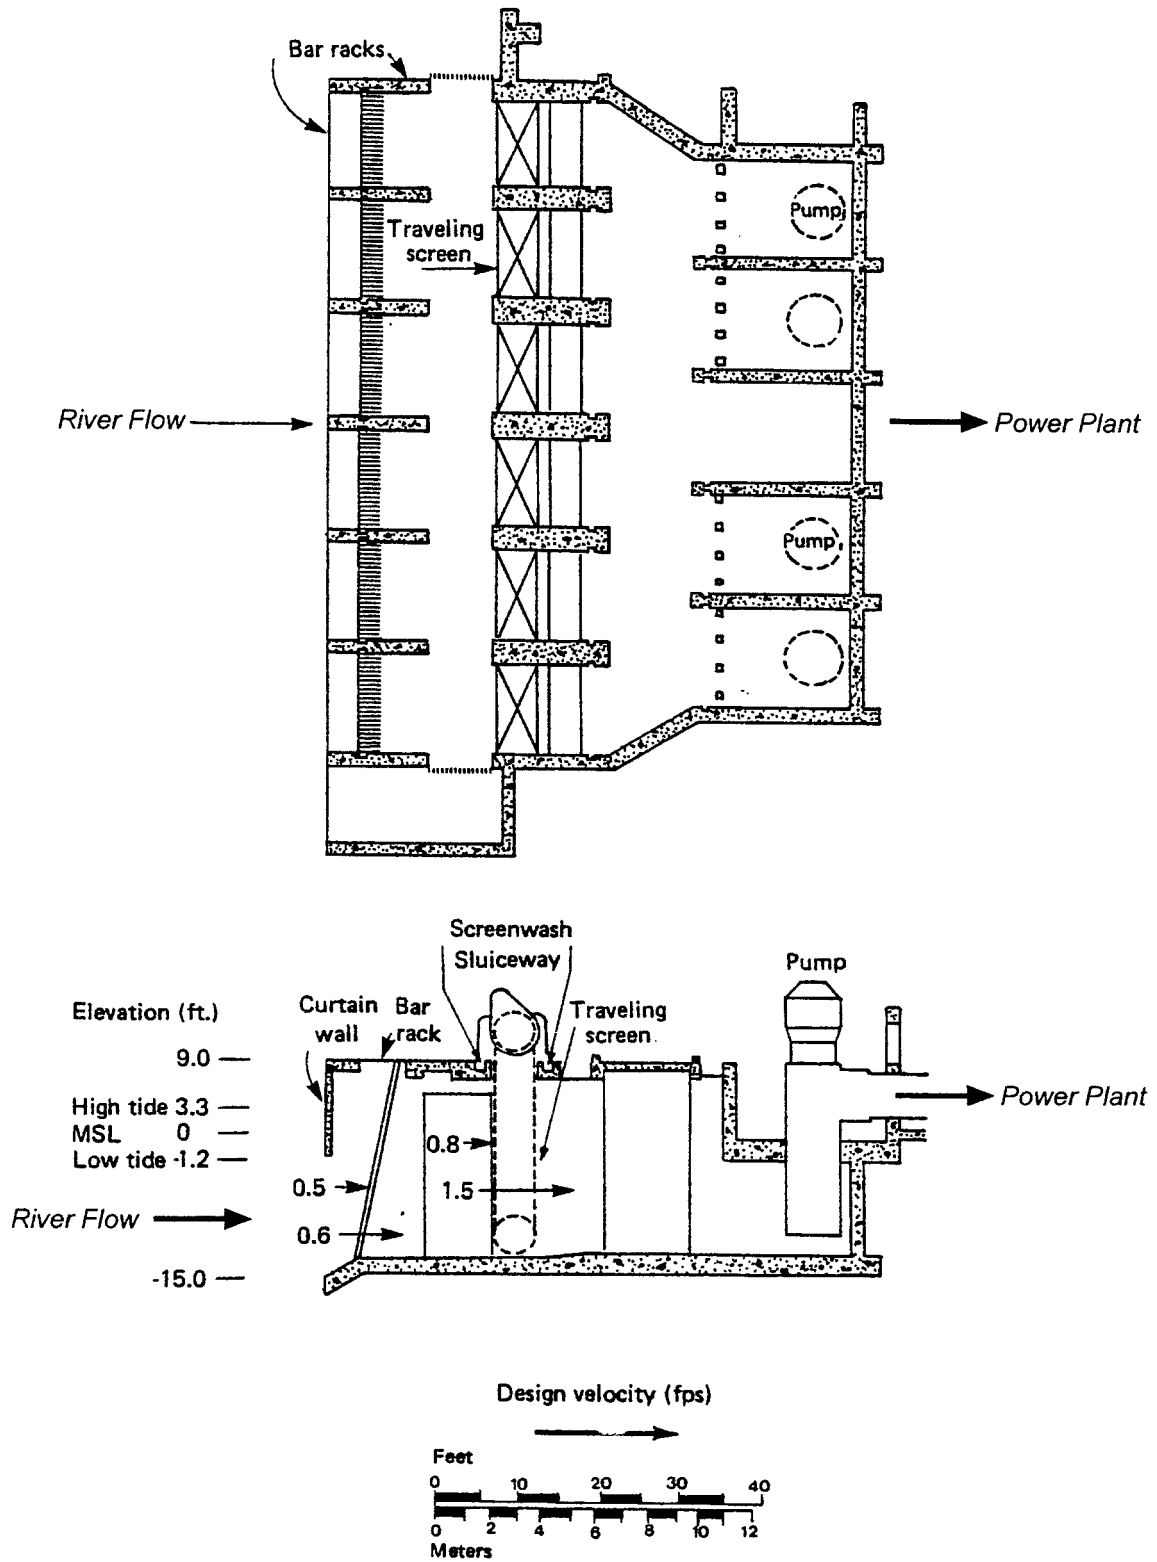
Plan and section schematic diagrams of Pittsburg Power Plant Units 5 & 6 intake structure.
